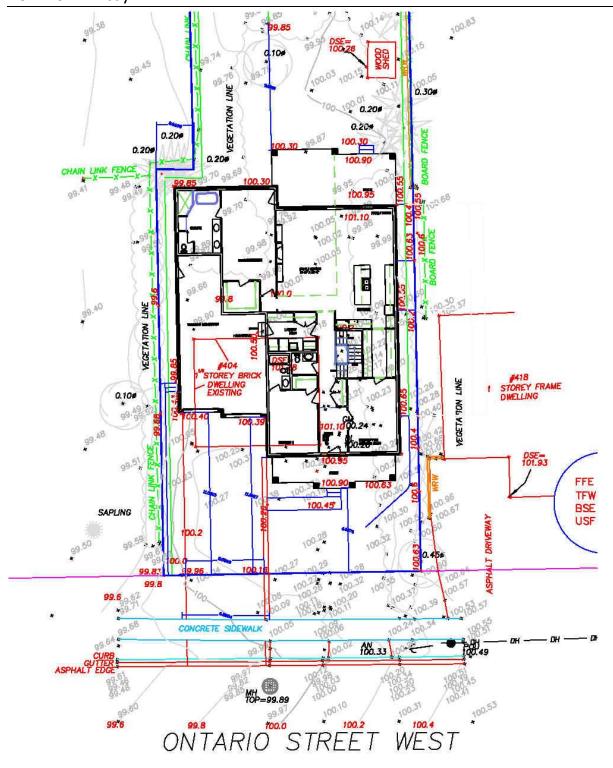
Proposed Site Plan for New Building at 404 Ontario Street.
